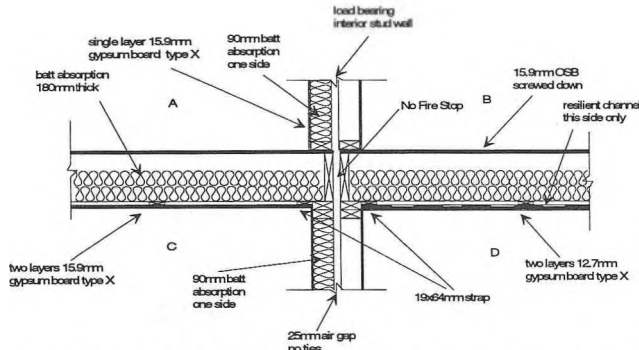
Sketch of Reference A construction which does have a fire rated A-C floor/ceiling assembly.
